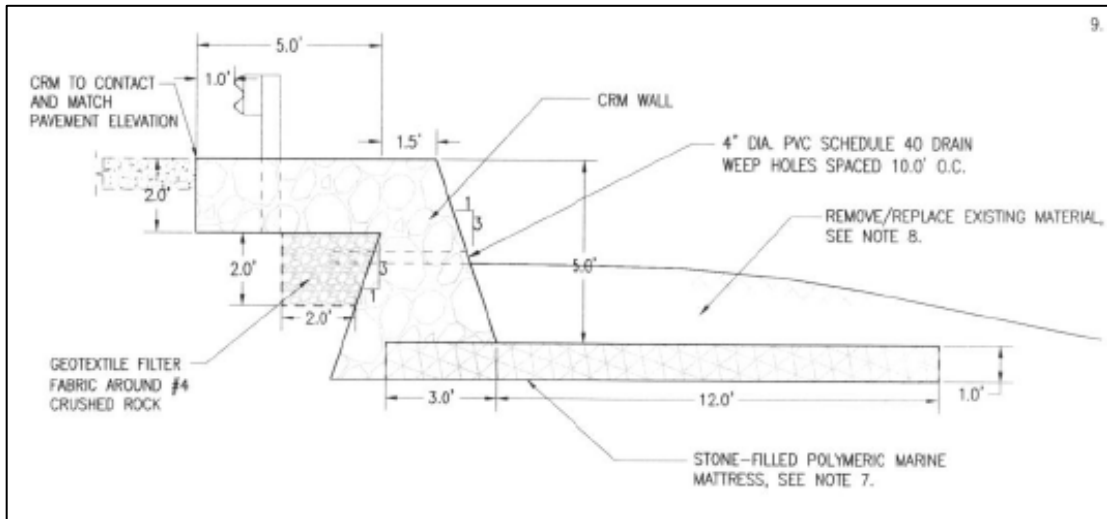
Concrete rubble masonry seawall with marine mattress scour protection.
